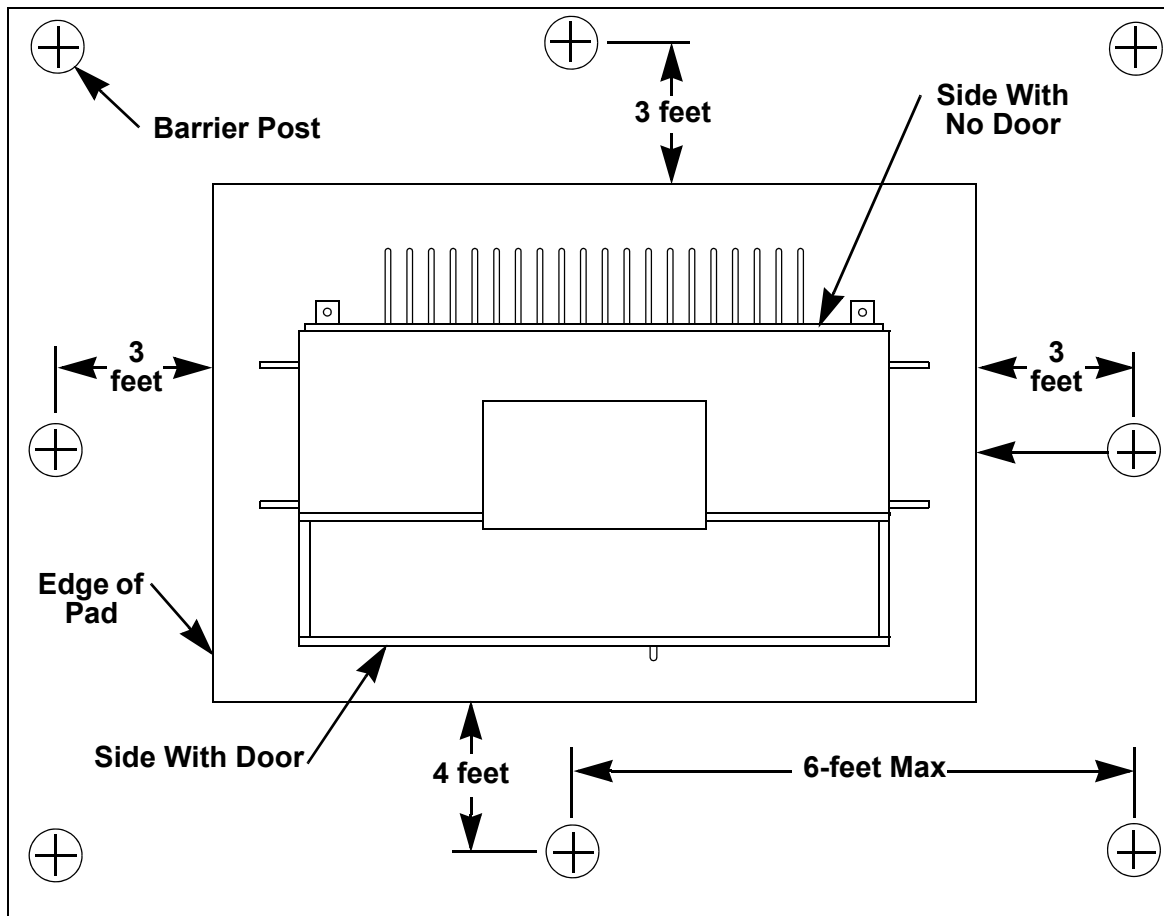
Barrier Post Locations at a Pad-Mounted Installation
